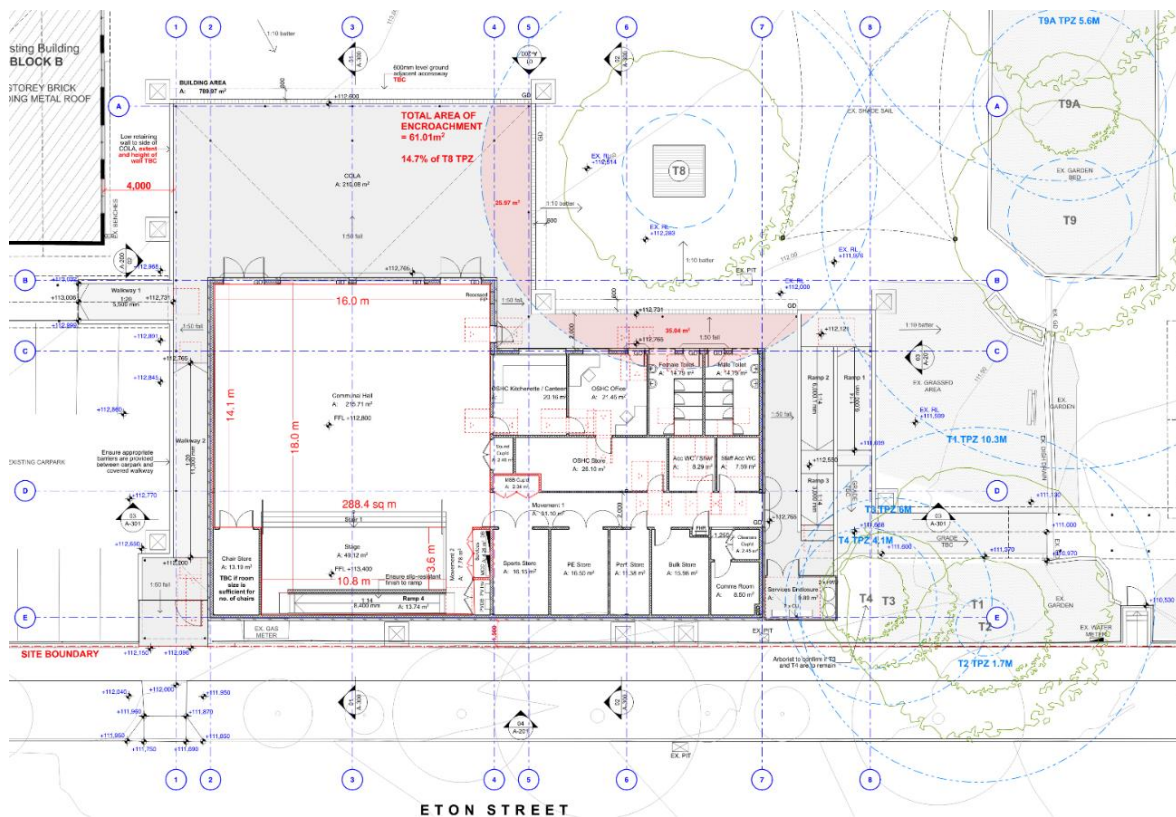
SPS proposed hall plan (Source: BKA Architecture)
